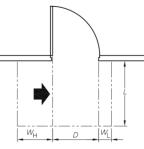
Circulation Space at Swing Doors - Door Opens Toward User
